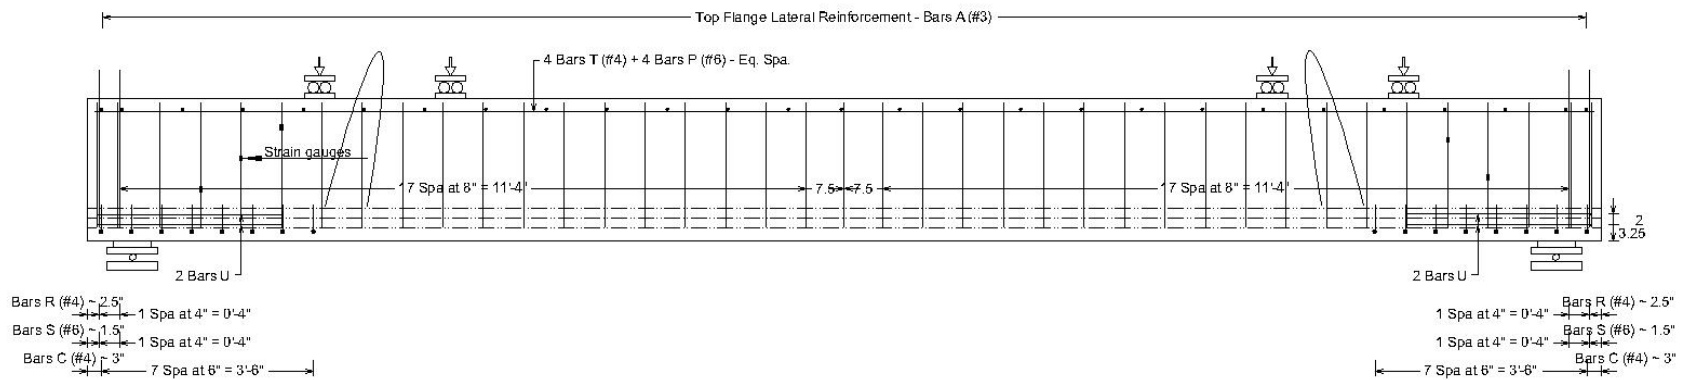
Concrete Dimensions and Reinforcement Details for Girder G2
